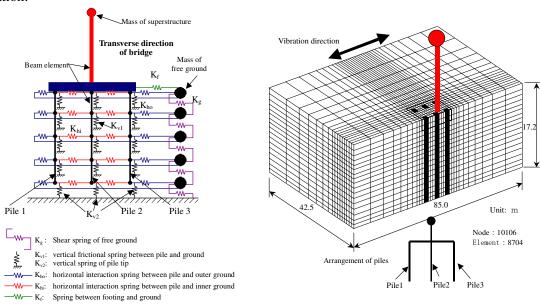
Simplified M1 model of ground-pile foundation-superstructure (3x3 piles)
